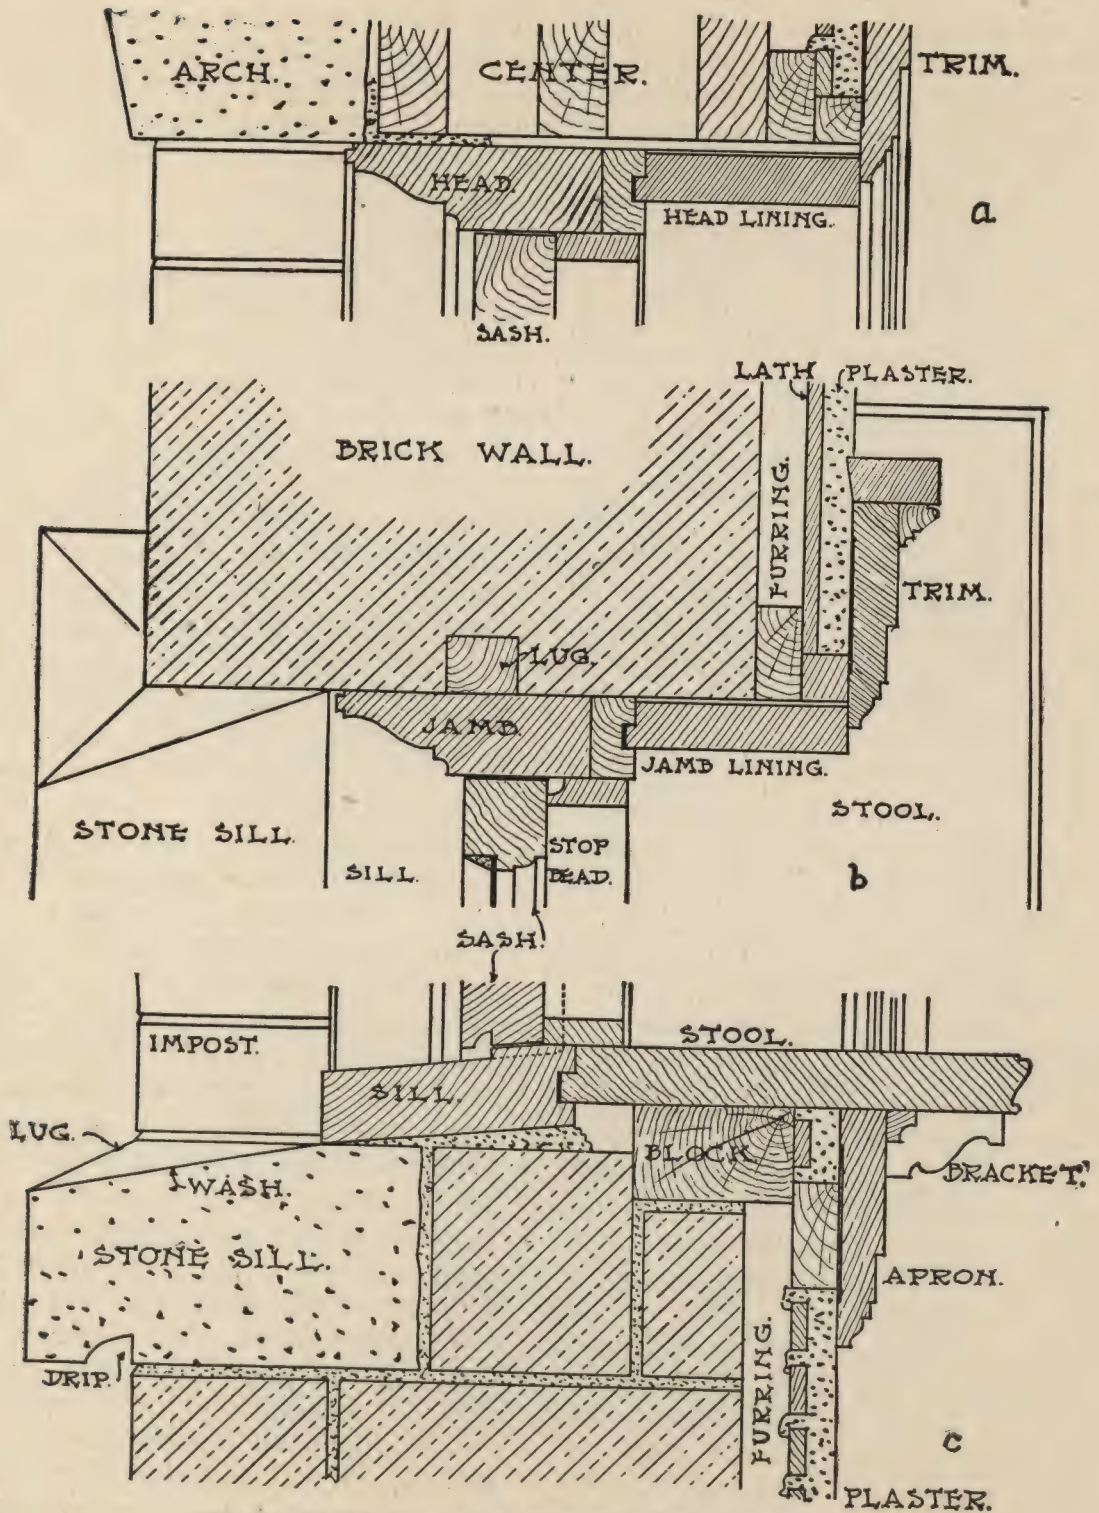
INEXPENSIVE CASEMENT IN BRICK WALL.
